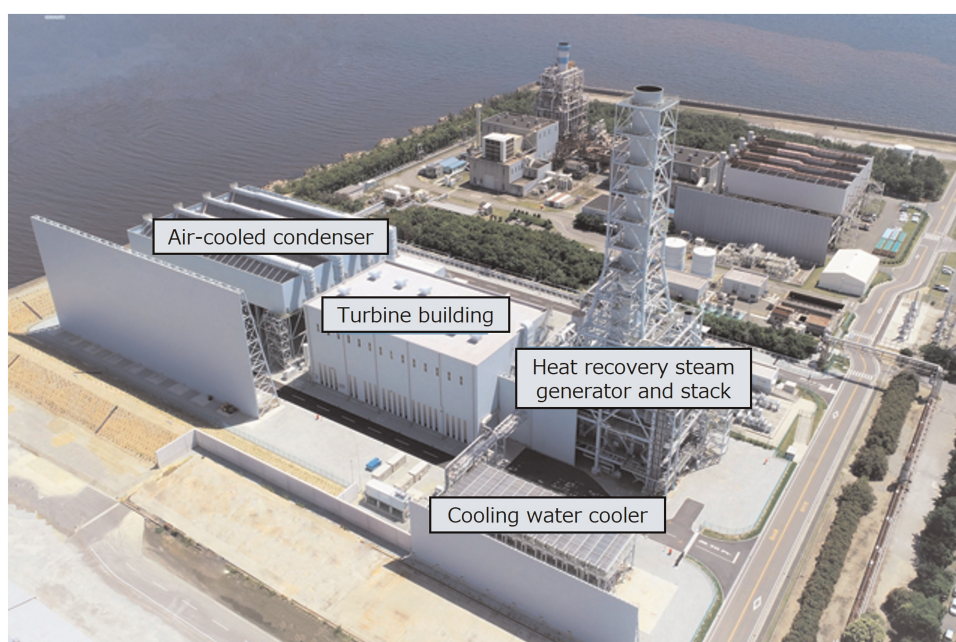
T-point 2 power plant demonstration facility (Hyogo, JAPAN).
